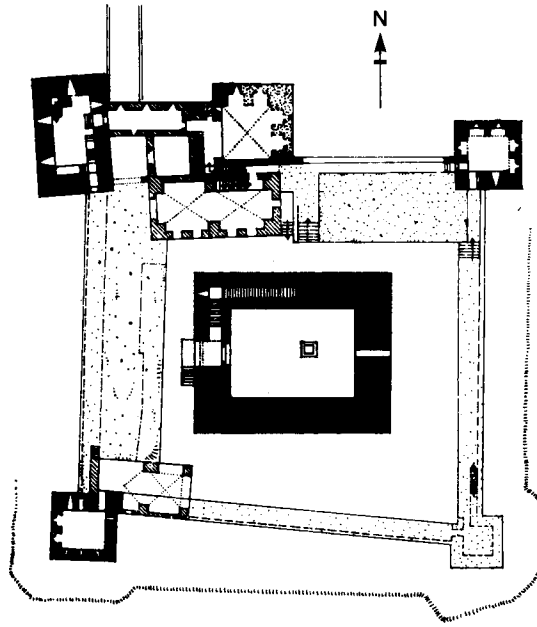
Giblet: plan of ground floor. Crusader work is indicated in black. The simple rectangular donjon is surrounded by a curtain wall with corner towers. The entrance complex on the northwest incorporated a tower of the Fatimid period, itself built on classical foundations.
